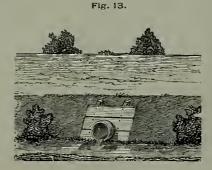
shows the end of a pipe culvert, protected by a small abutment of stone or brick. The foundation should of course extend far enough down into the ground to be below the influence of frost, as otherwise the alternate heaving and settling might throw the end pipe out of position. When stone or brick abutments are too expensive, a good and cheap substitute can be made of planks, by setting them on end, deep enough in the ground to hold them in place, and fitting them closely about the pipe; or still better by setting a post each side of the pipe (see Fig. 13), and by spiking the planks on horizontally, as represented above.
